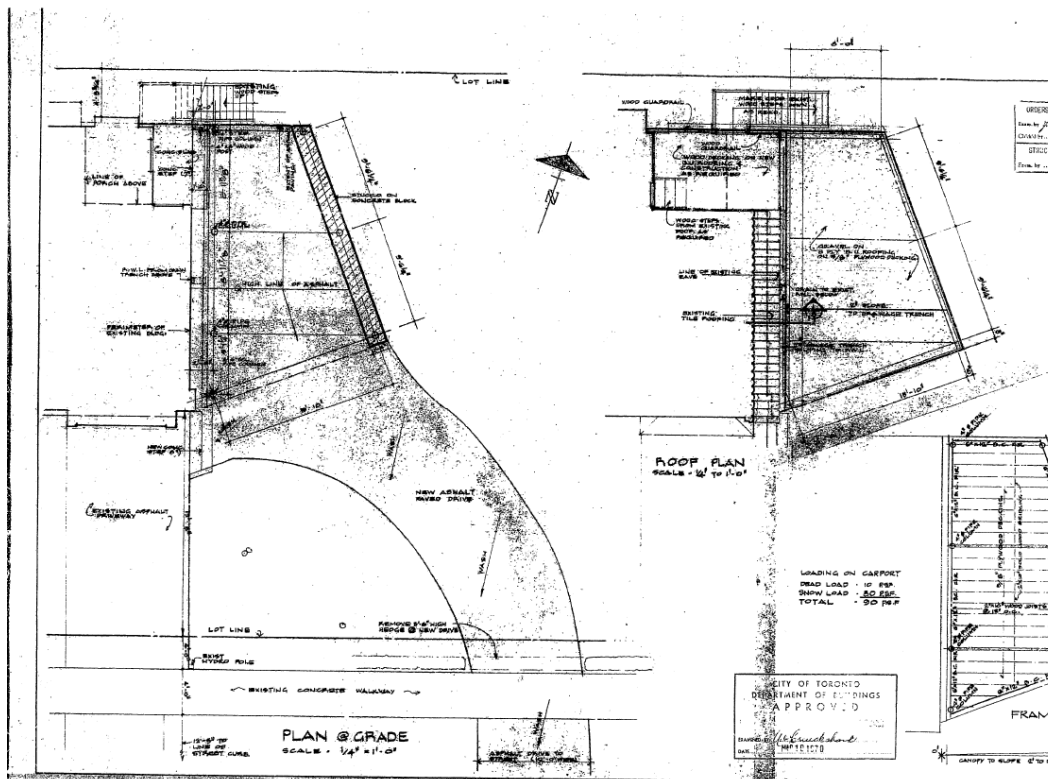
Plans for a carport addition with stairs to second storey and balcony (Buildings Records, 1970)
